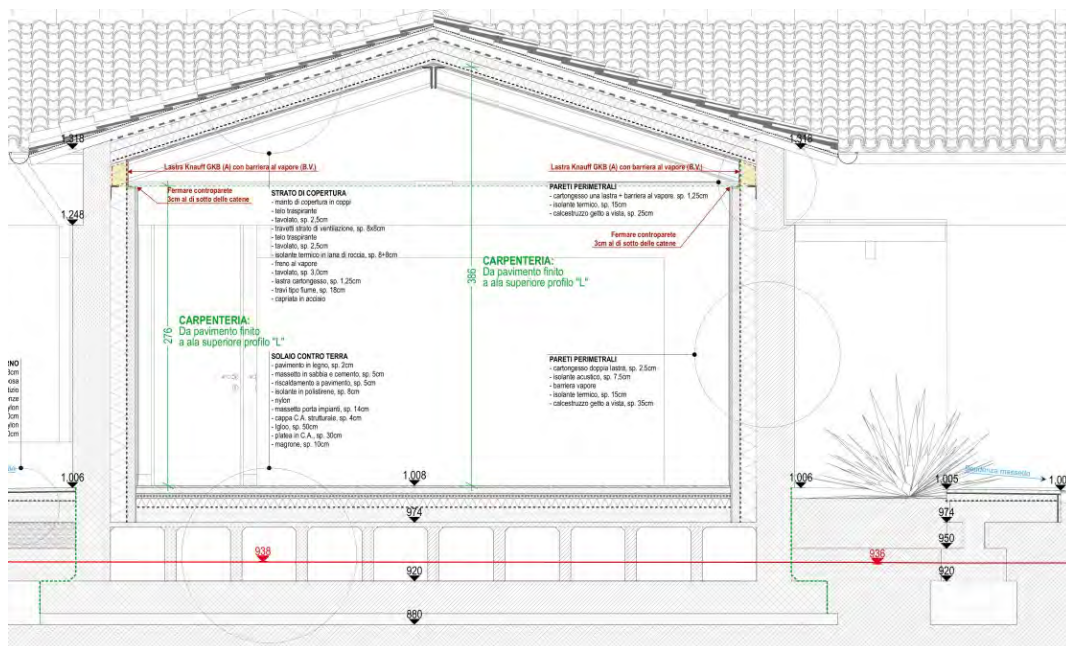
House in the poplar (MIDE Architects). And construction section. The external envelope is, from internal to external, made of: double drywall slab 2,5 cm, thermal insulation rock wool 7,5 cm, vapor barrier, thermal insulation rock wool 15 cm, exposed concrete wall 35 cm.
